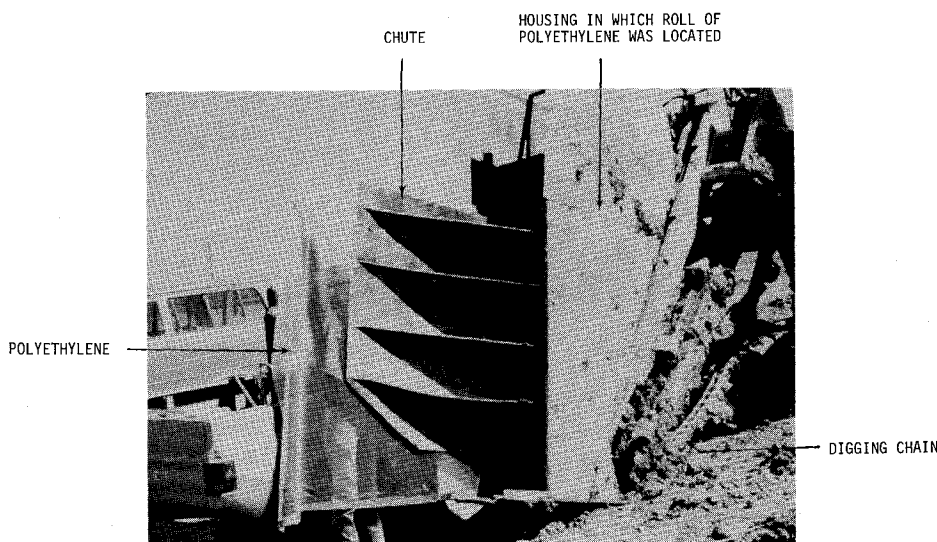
Polyethylene was discharged through a chute from a roll mounted on a spindle inside the metal housing which was attached to the trencher just aft of the digging chain.
